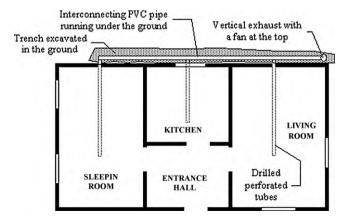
Group E–Perforated tubes drilled into the sub-floor region from the trench excavated in the ground.
